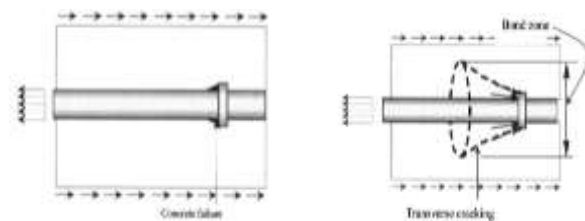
Mechanical interaction between deformed bar and the concrete.
